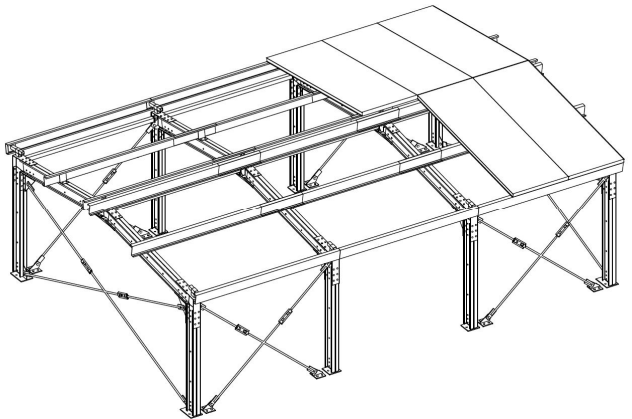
Cladded structure: Structure with purlins, sandwich panel cladding and without roof bracings.
